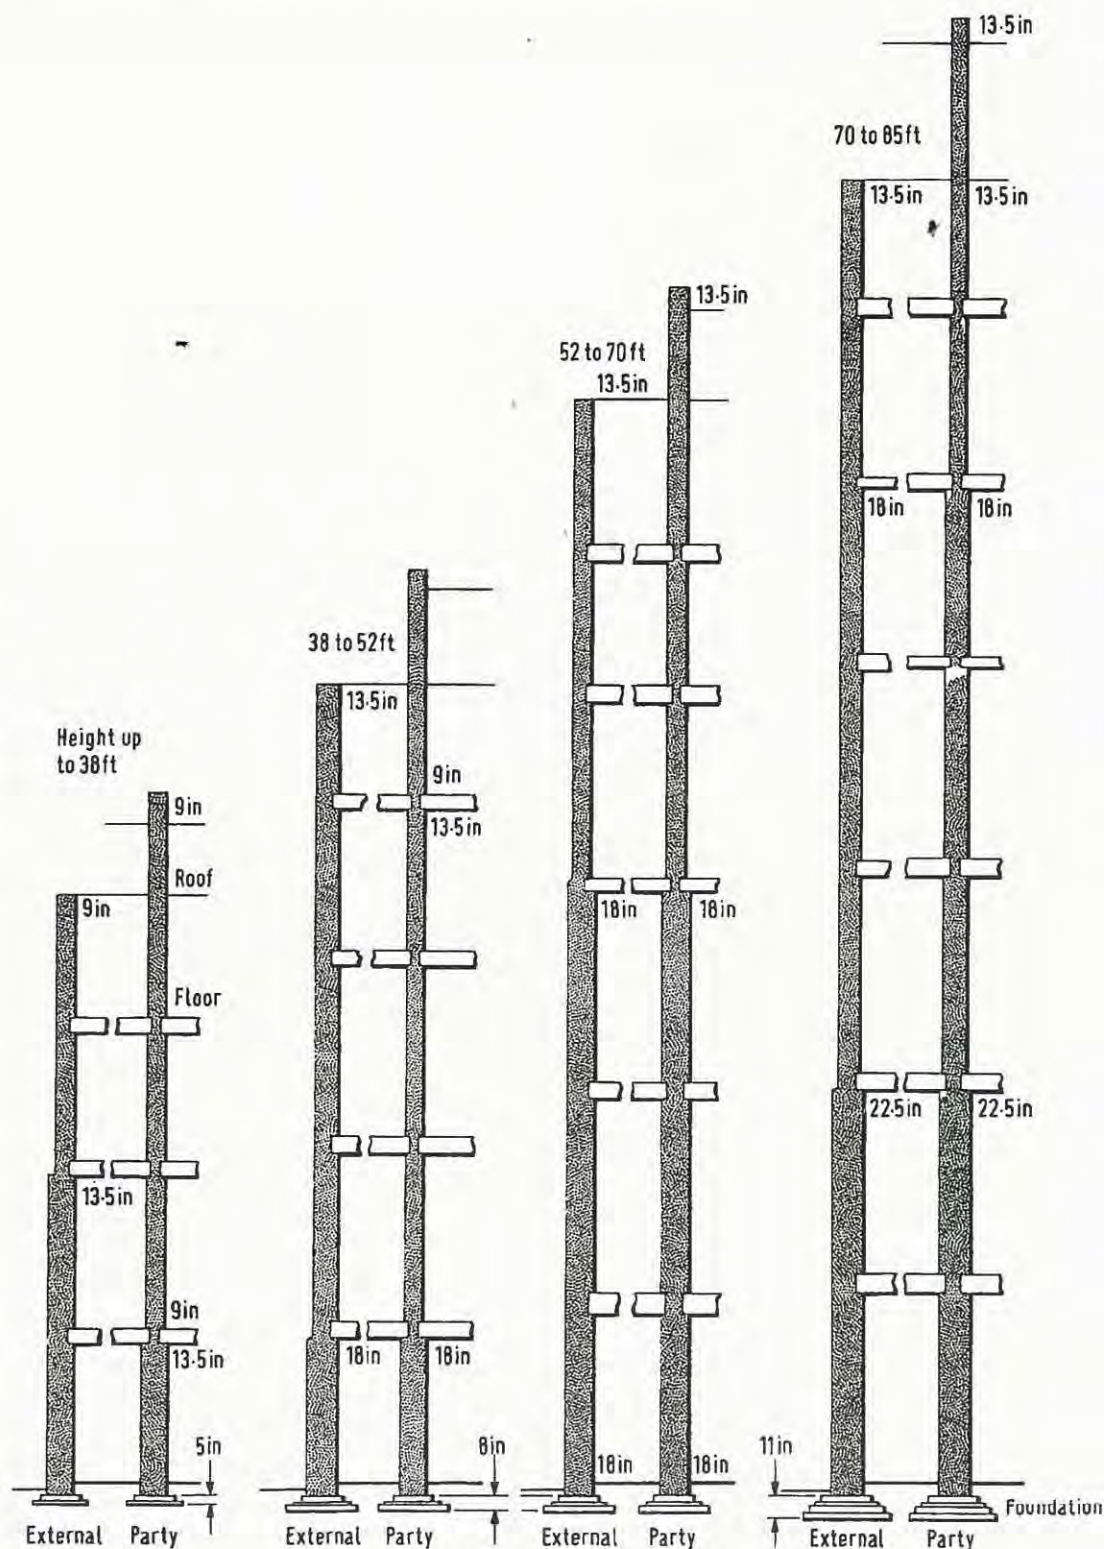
Thickness of walls in accordance with the London Building Acts of 1844
